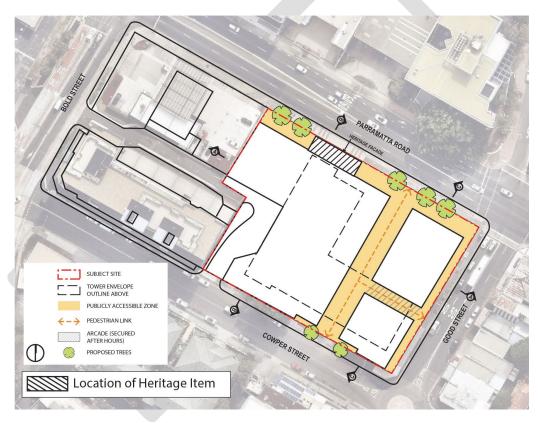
Publicly accessible zones and tree planting locations
